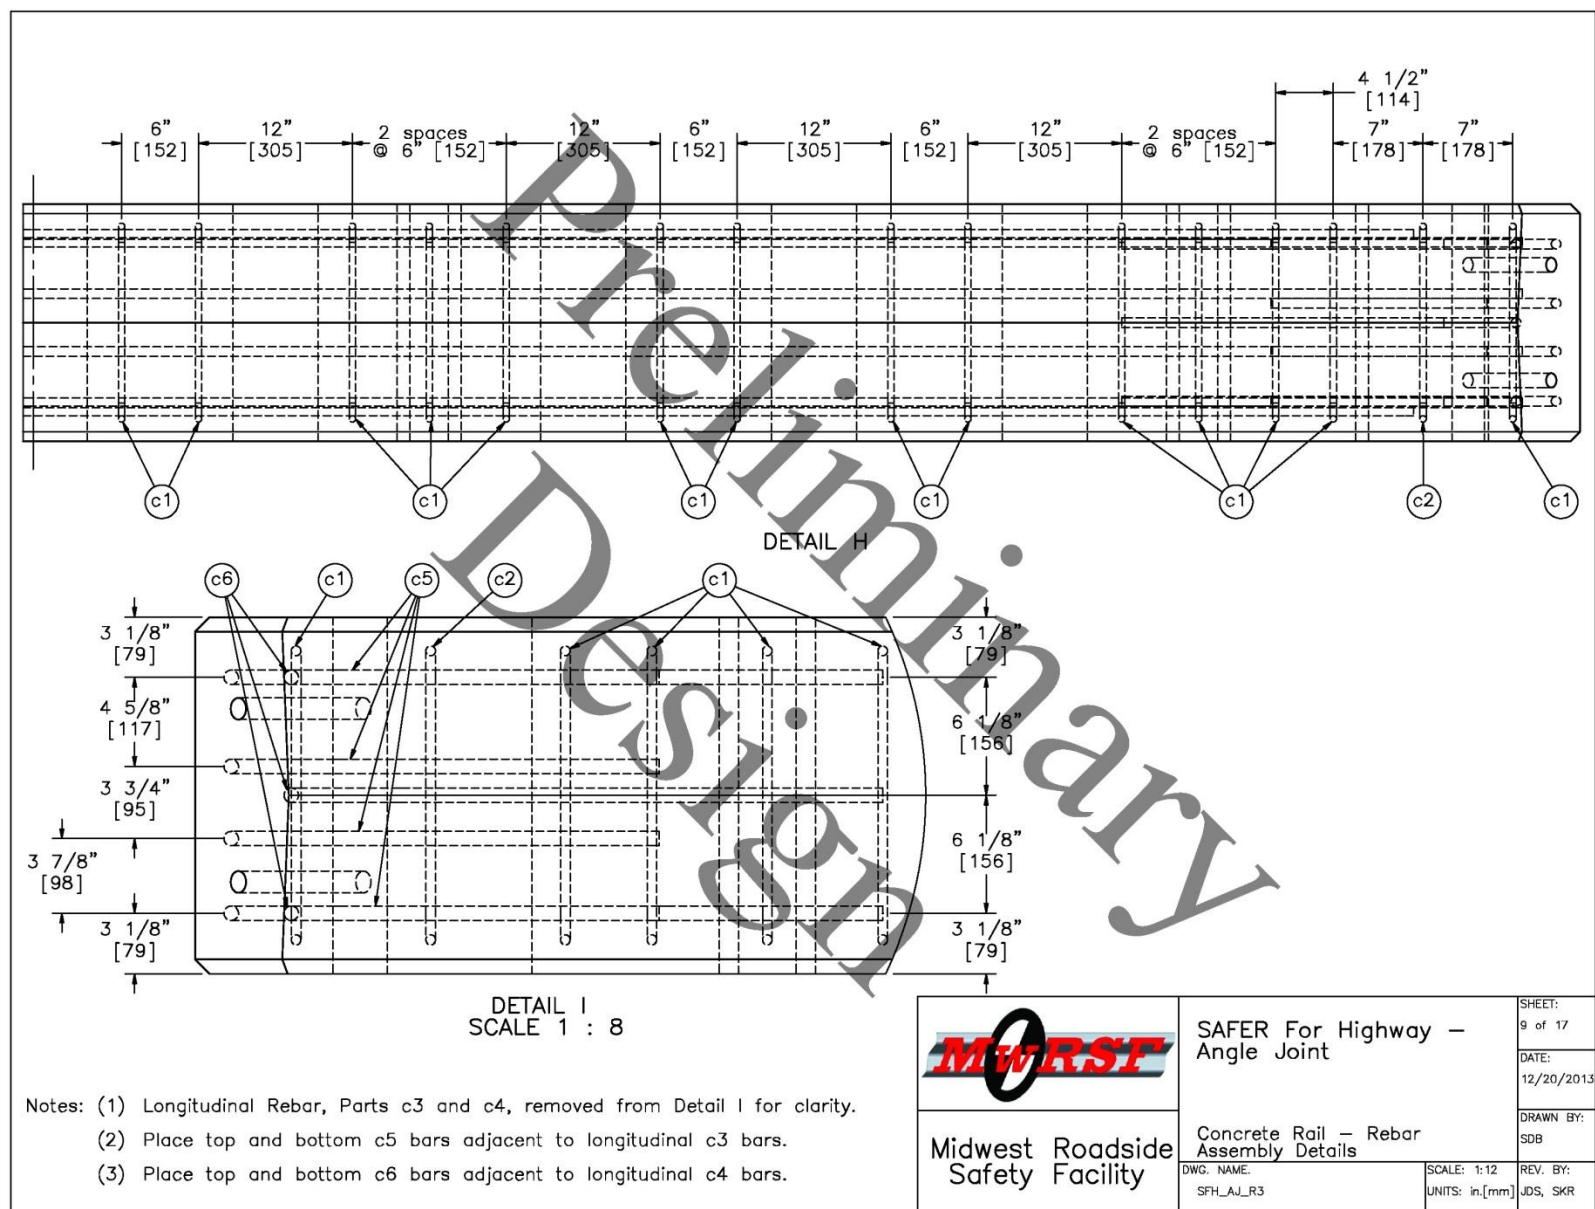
Preliminary Barrier Design, Rebar Assembly Details
